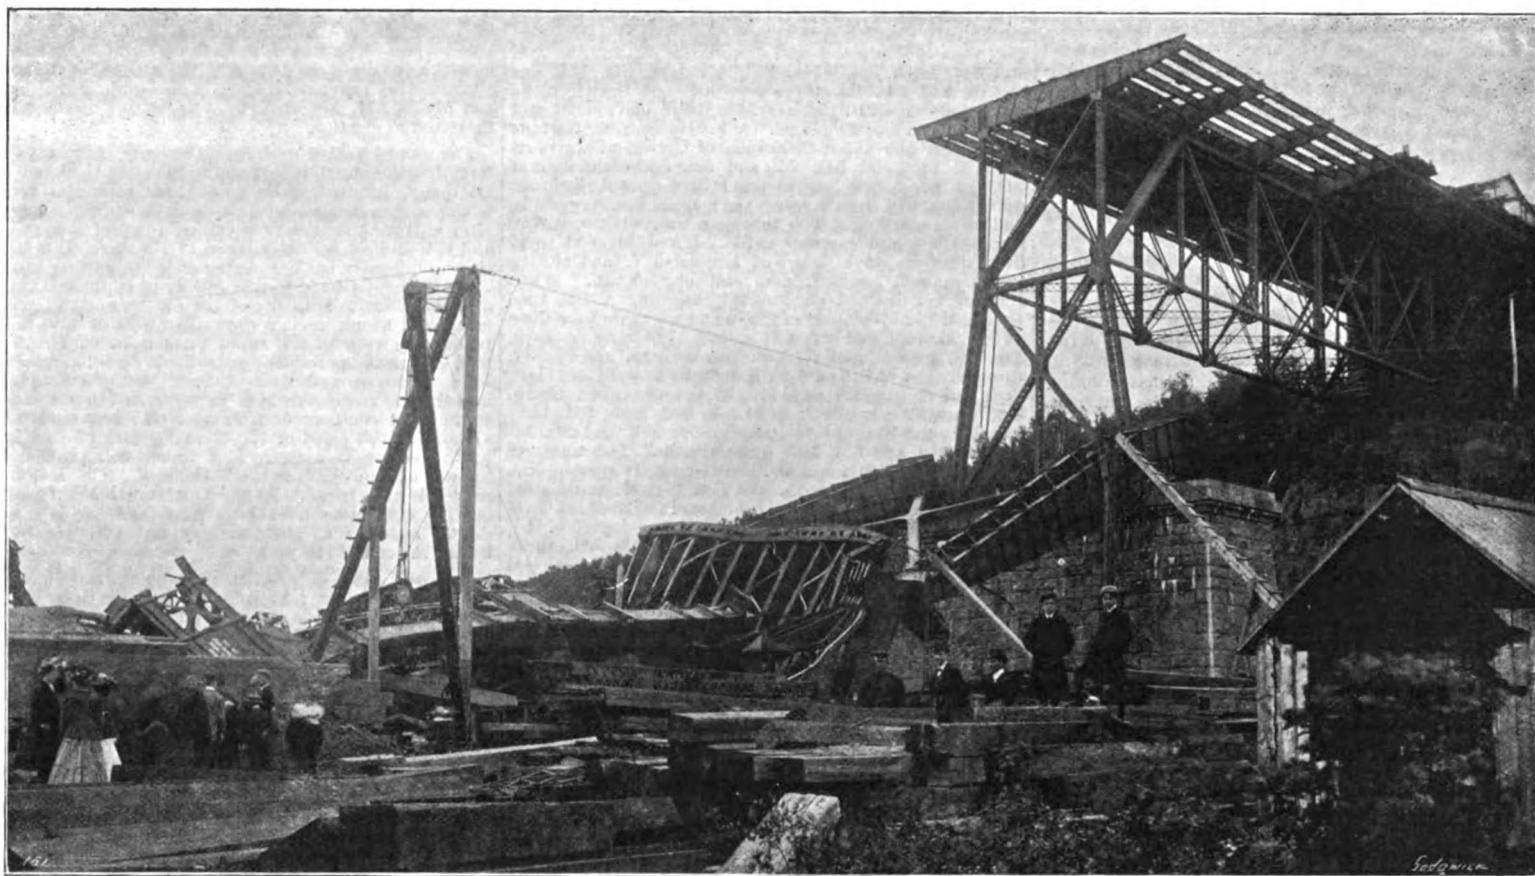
THE ANCHOR-PIER WITH THE UNINJURED APPROACH SPAN.
